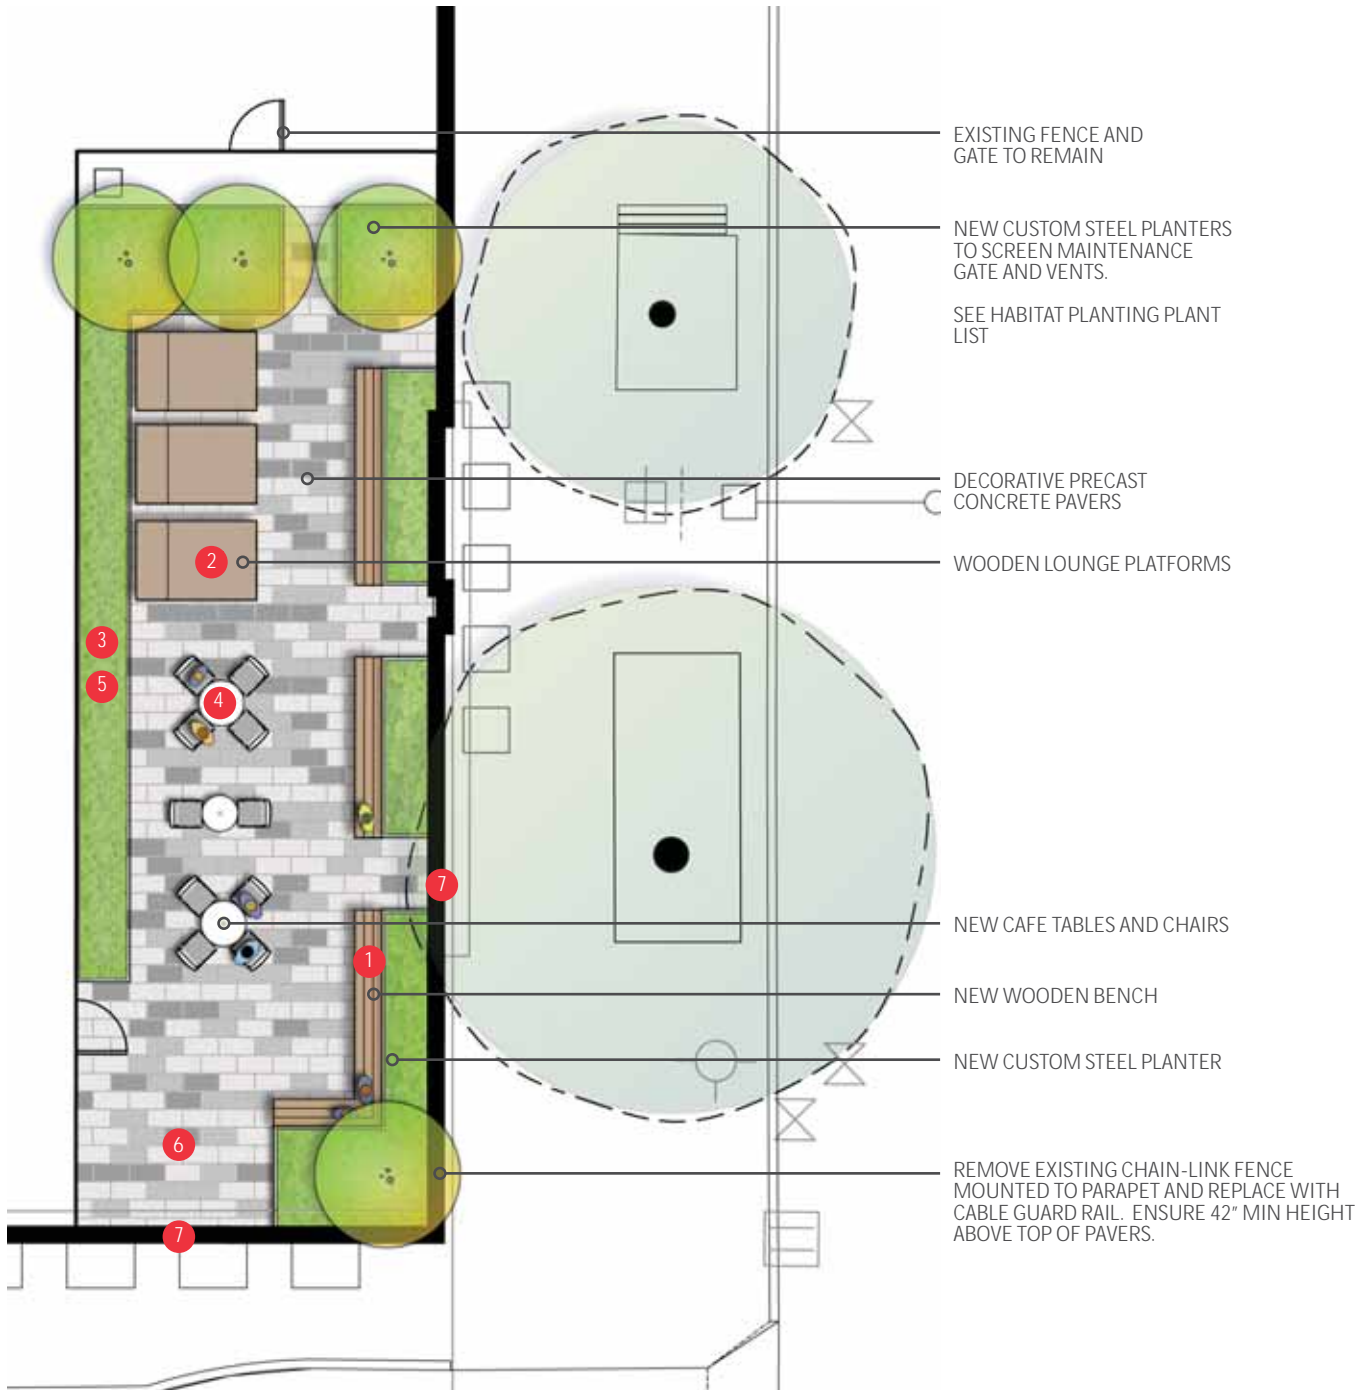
INN AT VIRGINIA MASON ROOF DECK - PROPOSED PLAN
